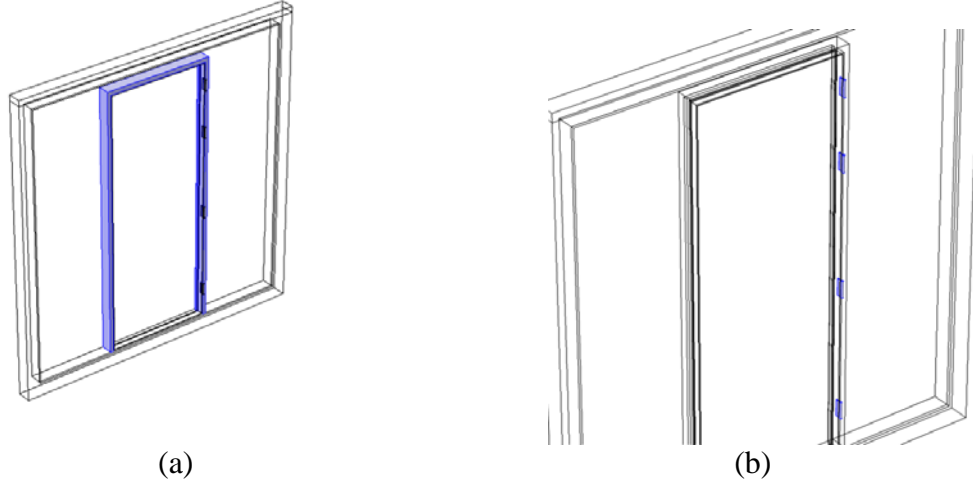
(a) Wooden Door frame, (b) Steel hinges
